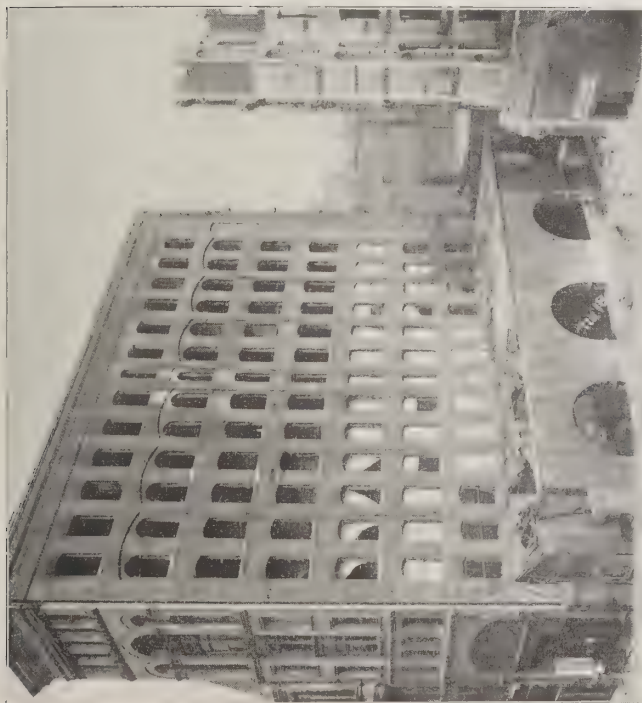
Methodist Episcopal Building with Citizens' Traction Company one-story building, where the fire stopped on the east. Ruins of Jenkins Building on the right.
